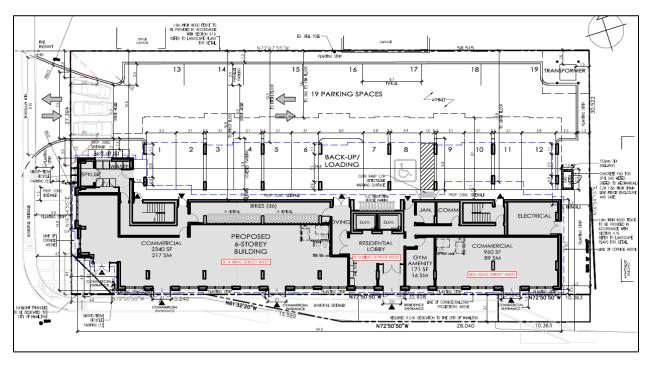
FIGURE TWO: CONDITIONALLY APPROVED SITE PLAN (2025)
